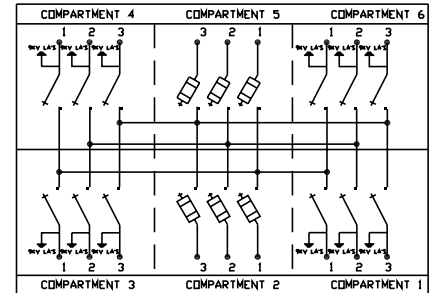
Four incoming switches and two fused feeders
